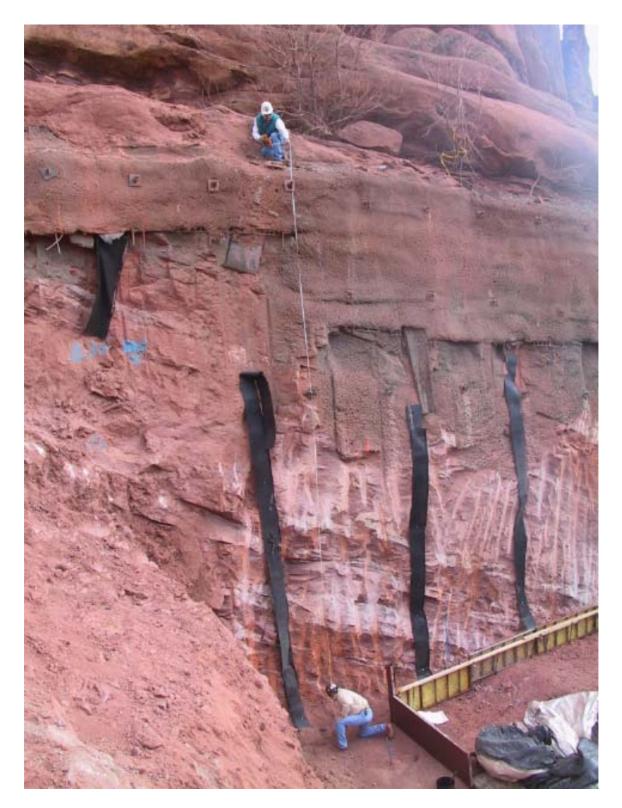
Soil nails were used to stabilize the 35-ft high cut during construction of the new Visitor Center at the top of the amphitheatre.
